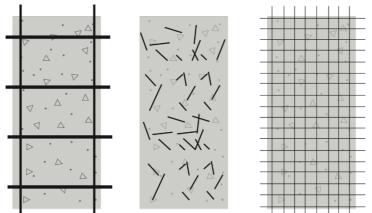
Illustration showing different types of reinforcement for concrete. From left; steel bars reinforcement, fibre reinforcement and textile reinforcement. (Illustration: Ellen Simonsson)
